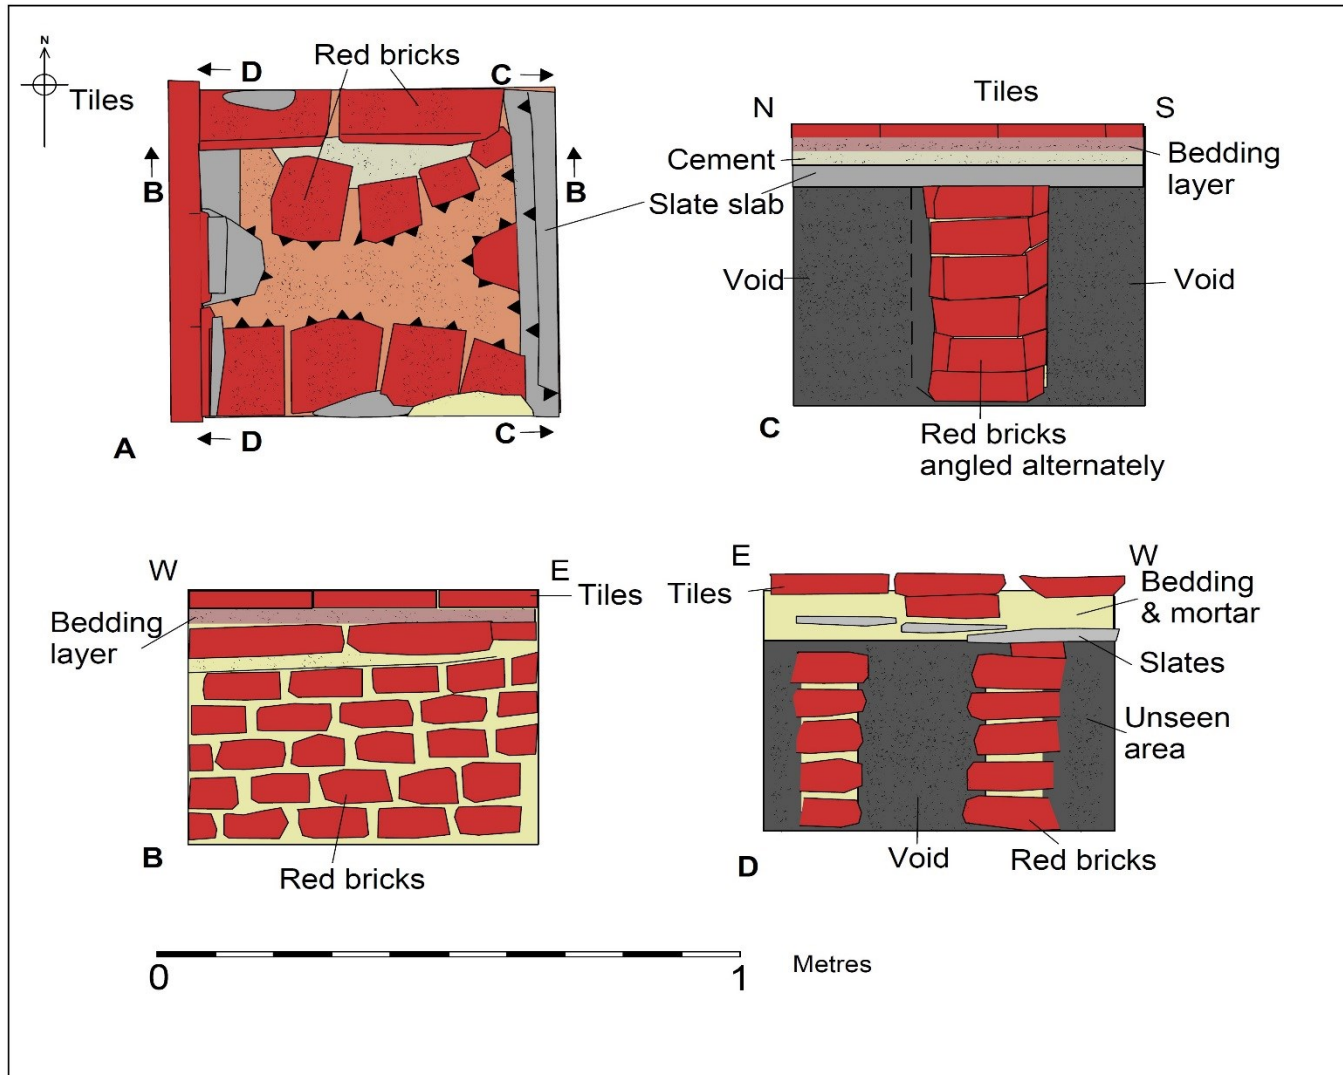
A. Plan of T.P 05. B. West facing section. C. South facing section. D. East facing section
